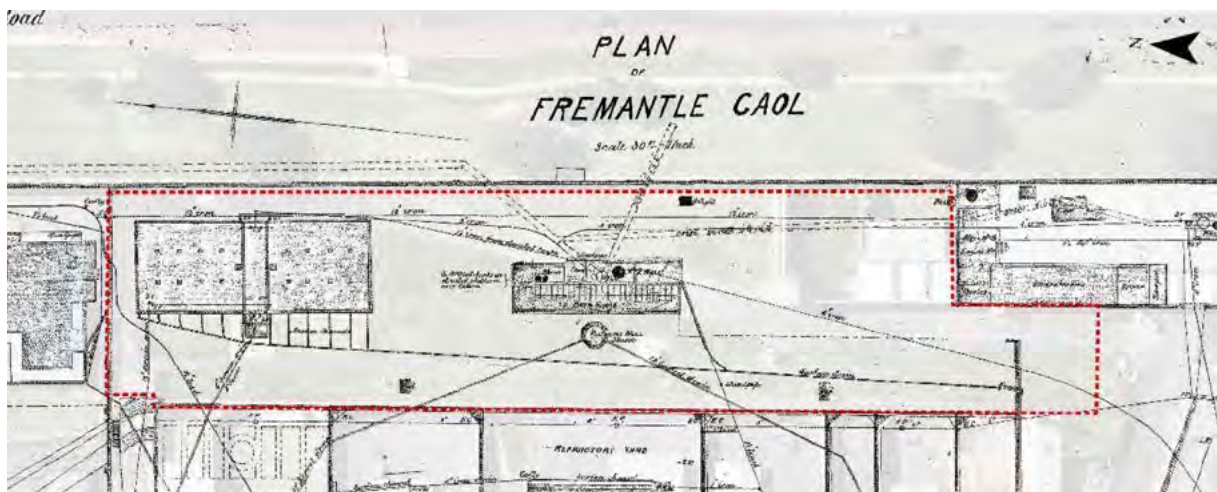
Site plan from approximately 1890 showing detail of the Bath House, East Cisterns and associated wells and structures. The construction of the East Cistern, as well as the numerous subsurface services (pipes and drains), will have impacted earlier archaeology. An 'ash pit' is marked as a black square against the Prison wall on the east of the zone. Two rectangular features are indicated on the western side of the zone. In a later plan each one is annotated as 'shed' (Figure 12). Note that a well is indicated on this plan, on the boundary between this zone and the East Workshops zone (see also Figure 21).
